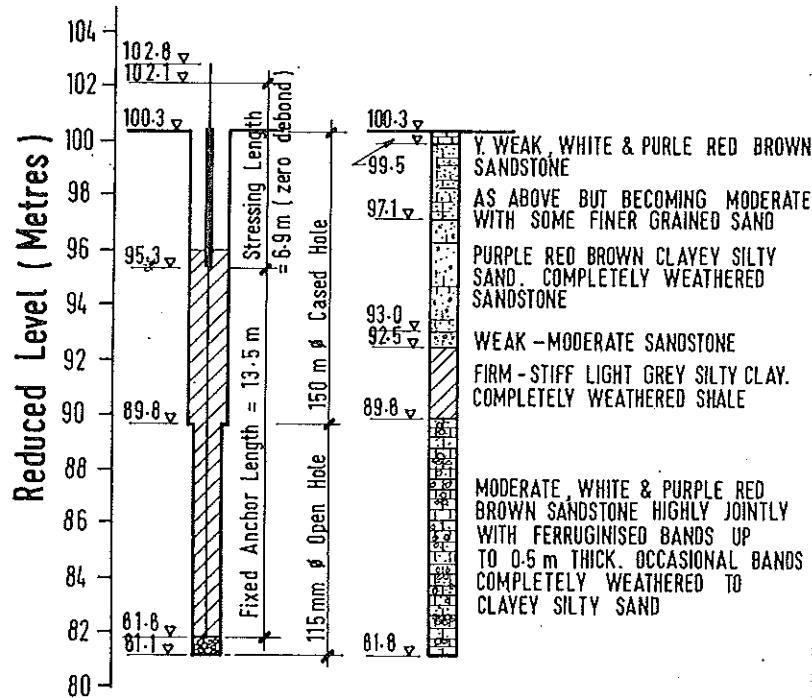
Geometry and Insitu Soil Profile of Test Anchor
